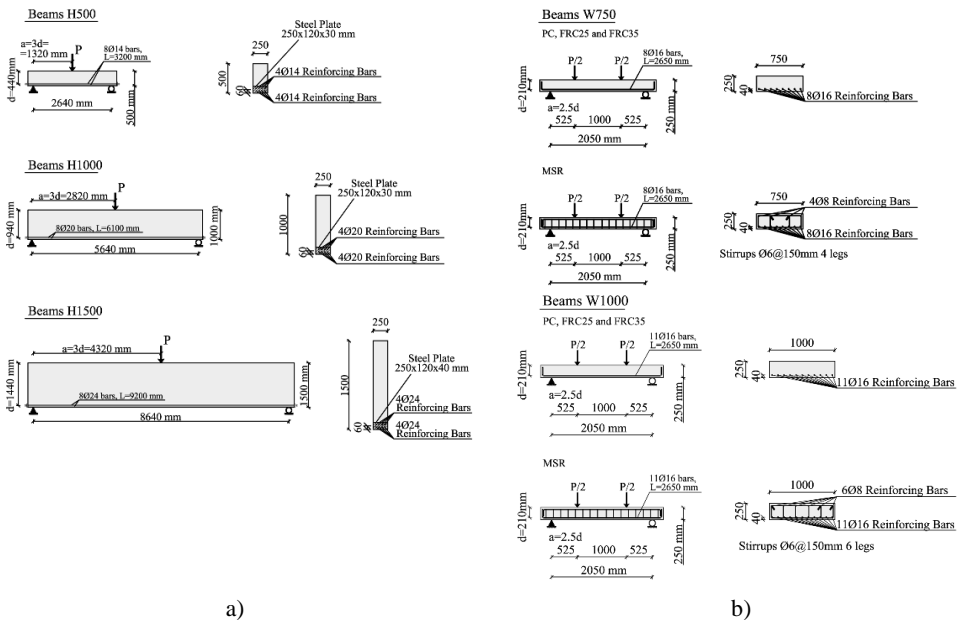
Geometry and reinforcement details of deep (a) and shallow beams (b).
